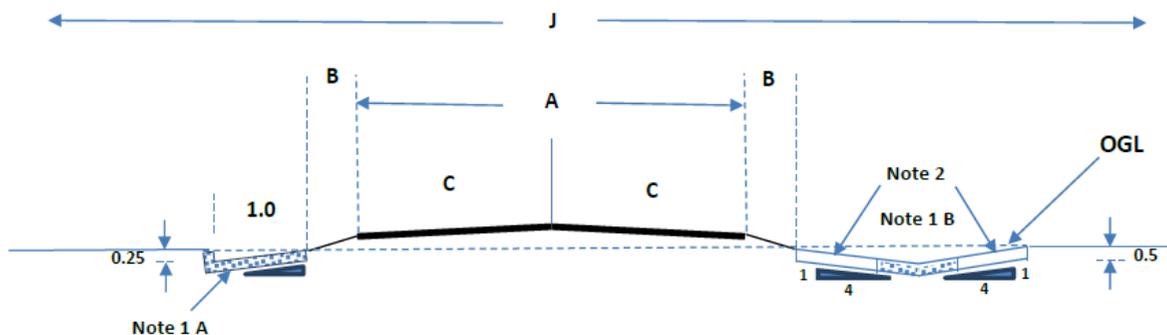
Typical cross section: DC1 – 4, Escarpment Terrain, Paved
